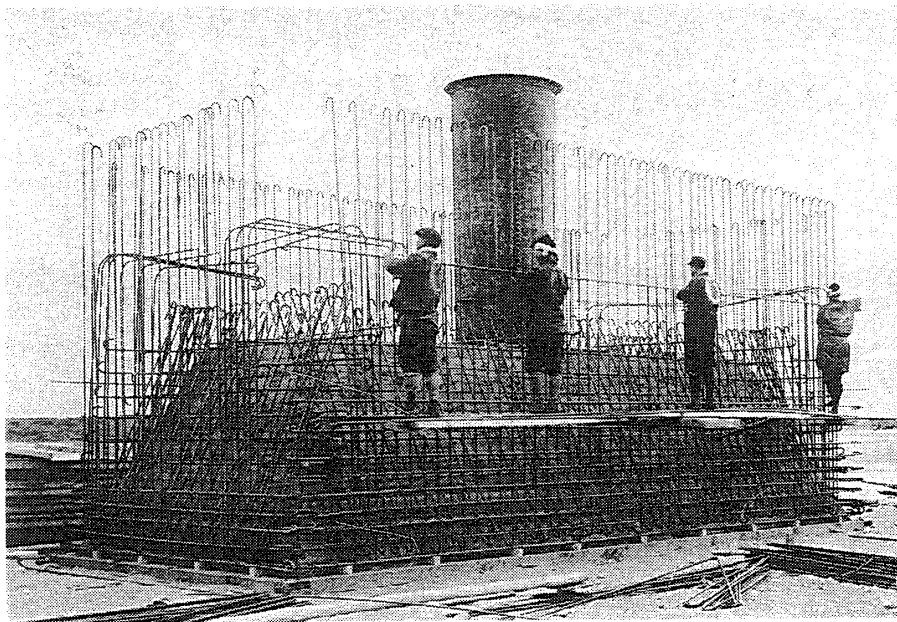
・2 Workmanship of Forms and Placing of Reinforcement of Working Chamber (Yoshino River Railway Bridge)
